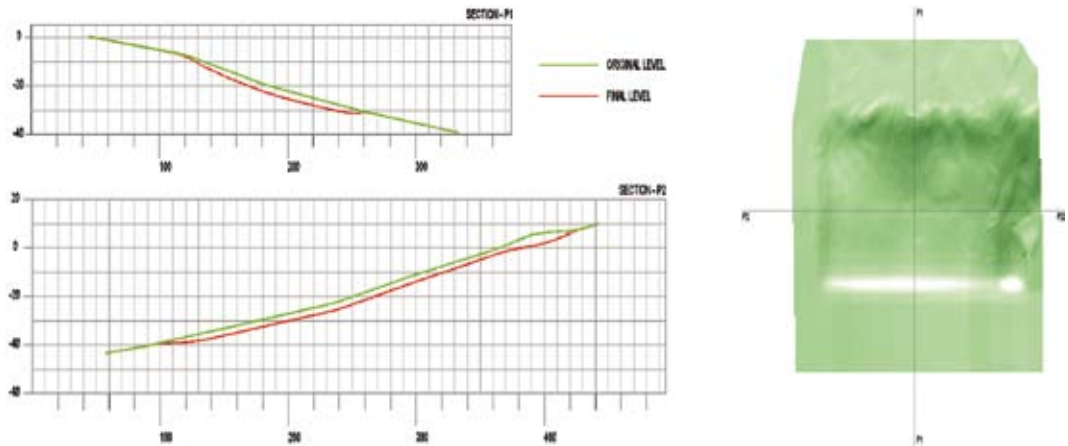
Deformed surfaces at the lower part of the clay protection layer
